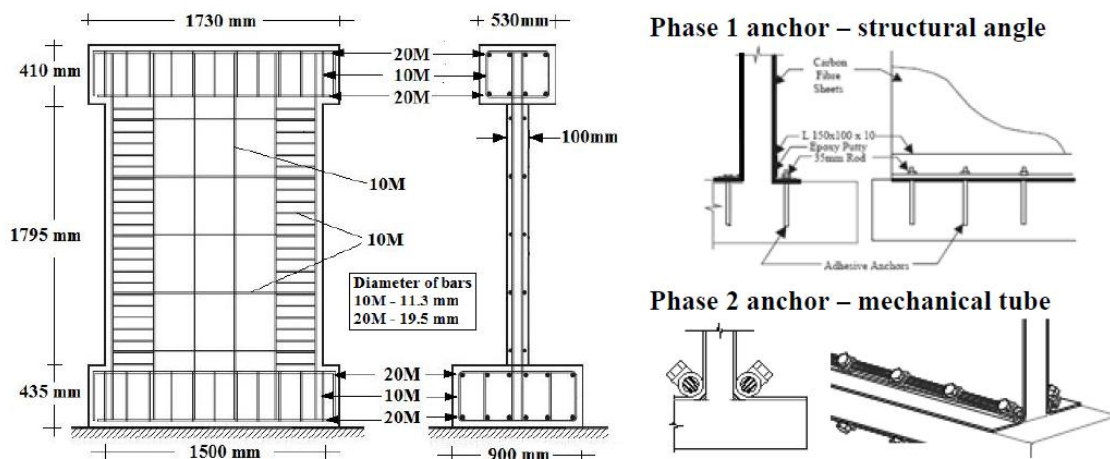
Shear wall design details (Phase 1 and 2) [14]
